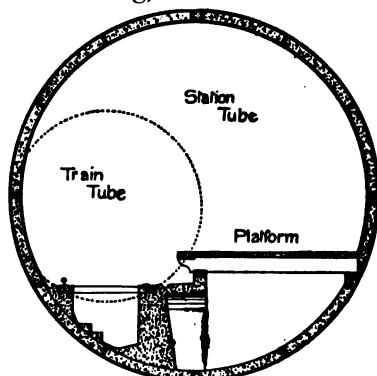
Section of station tunnel, Central London Railway, showing two train tubes.
